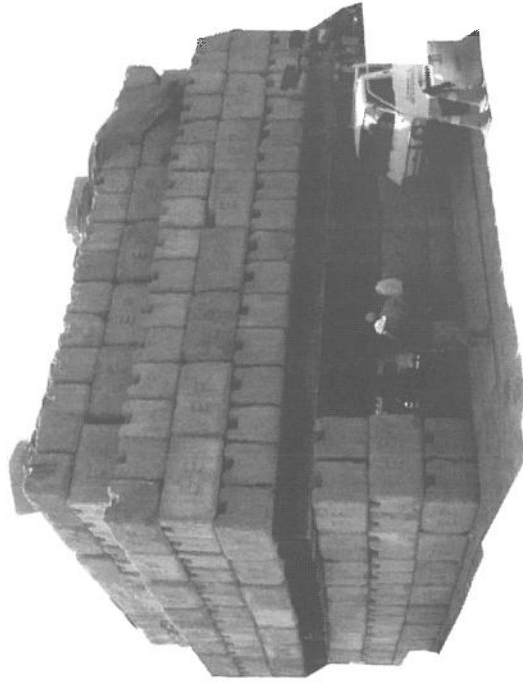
(c) – static load test using kentledge (concrete blocks) for reaction
